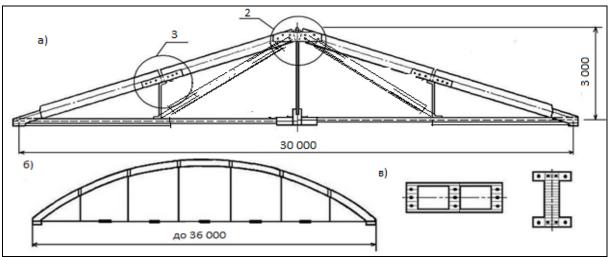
Types of wood steel trusses: a- English truss (trapezodical);б - segmental; в- section of the truss.
